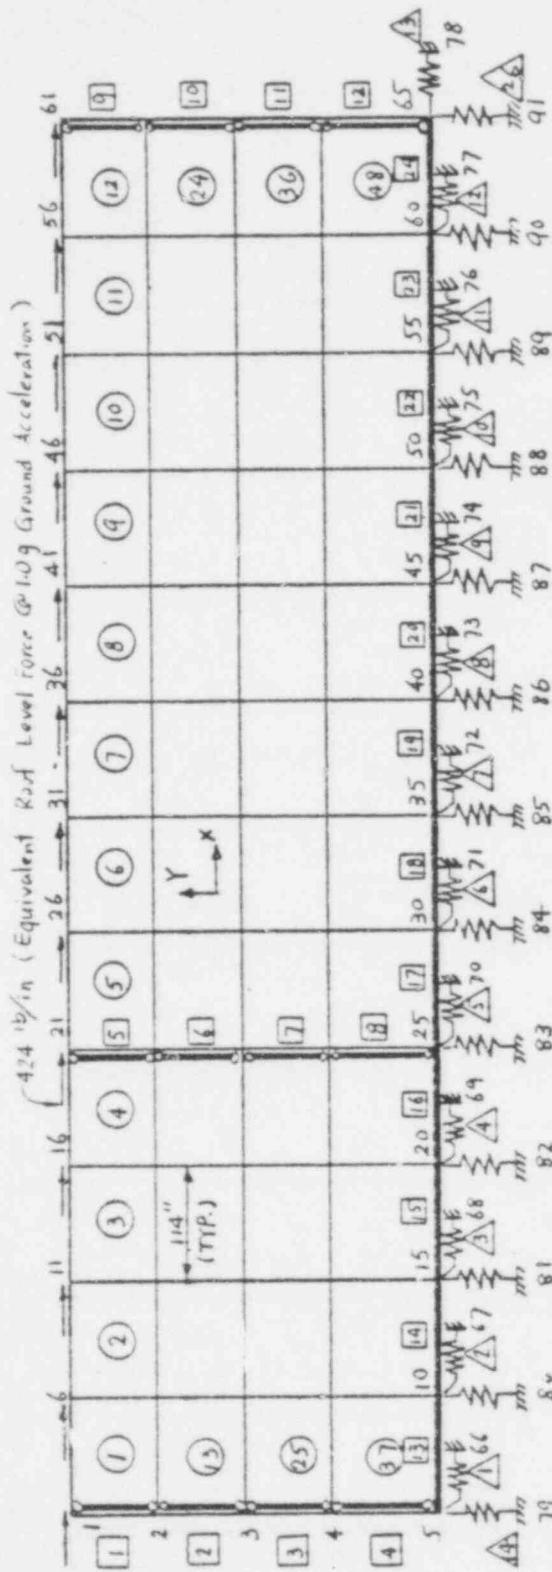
FINITE ELEMENT MODEL OF WEST WALL
